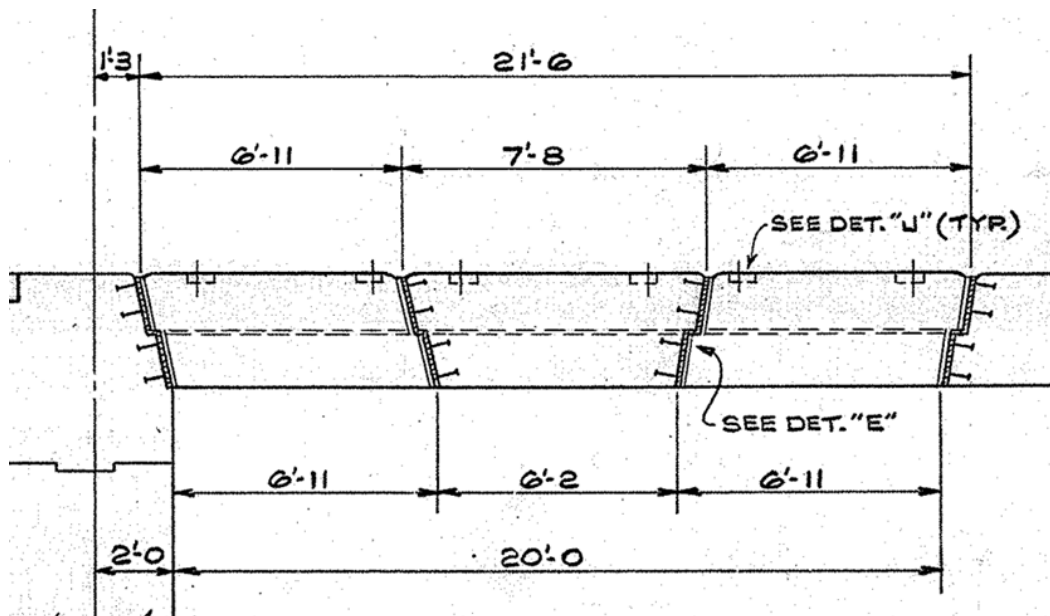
Cross section view of typical access hatch a using three shield plugs.
